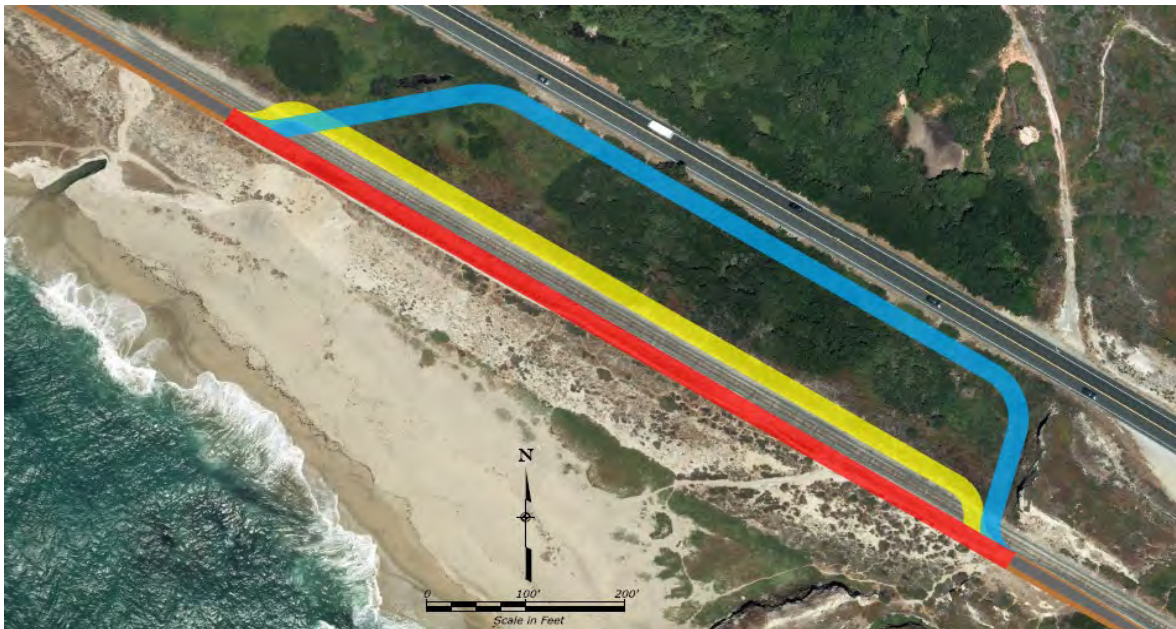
Trail re-alignment alternatives. The proposed trail is in red. Photo: FHWA.
